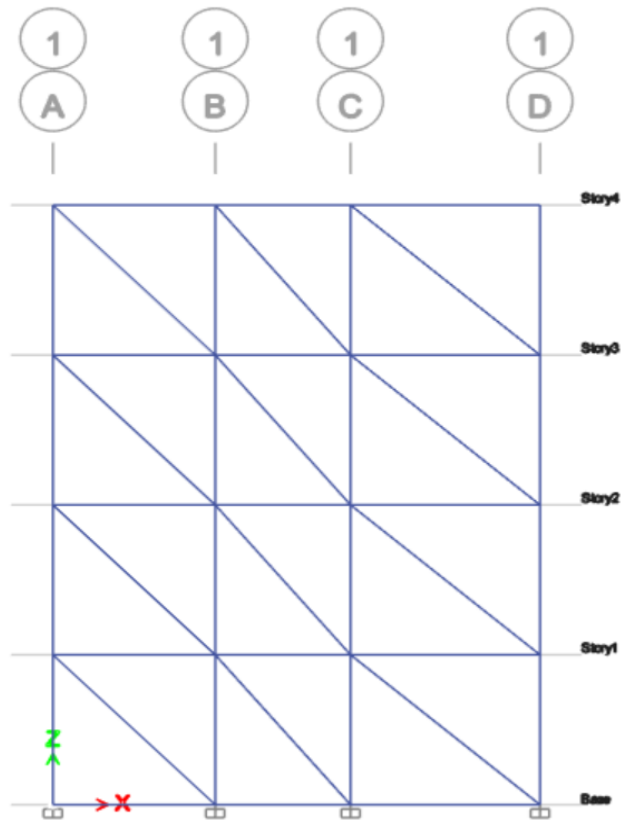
Elevation view of CMS with wall modeled as a single diagonal strut
